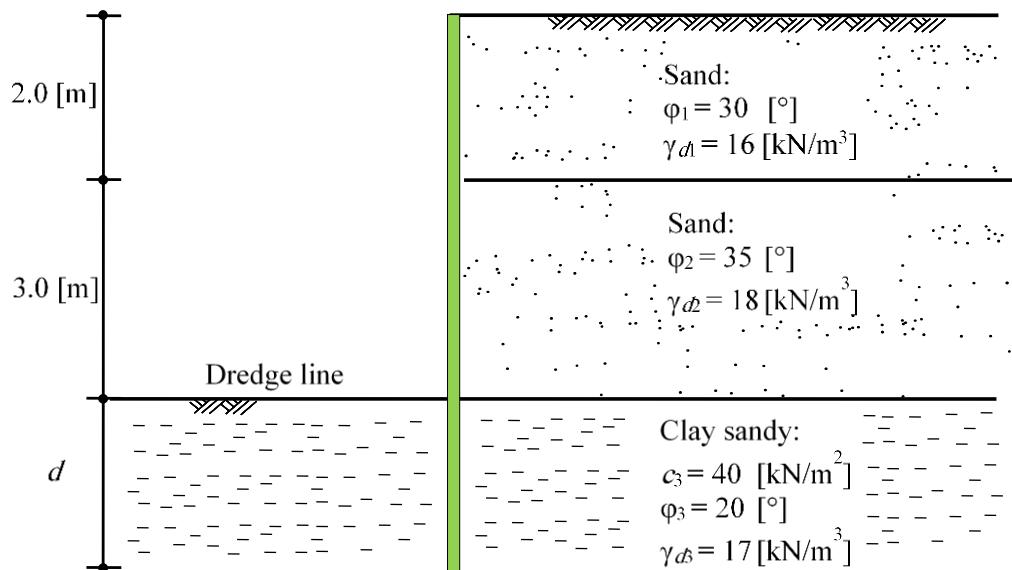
Cantilever sheet pile penetrating in clayey soil
